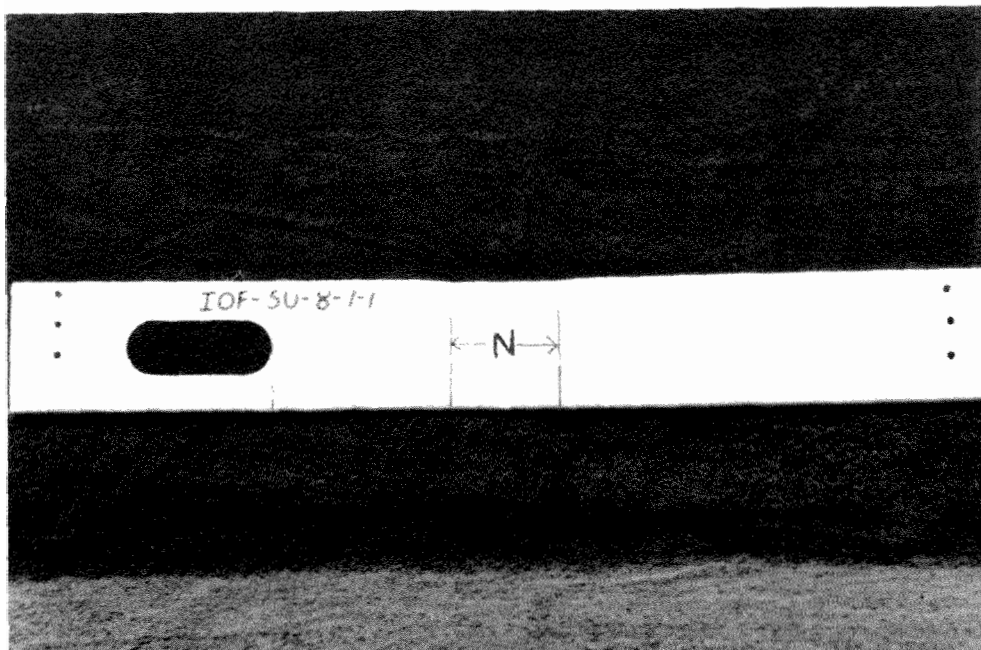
Typical Unreinforced IOF Web Crippling Failure, IOF-SU-8-7-1
